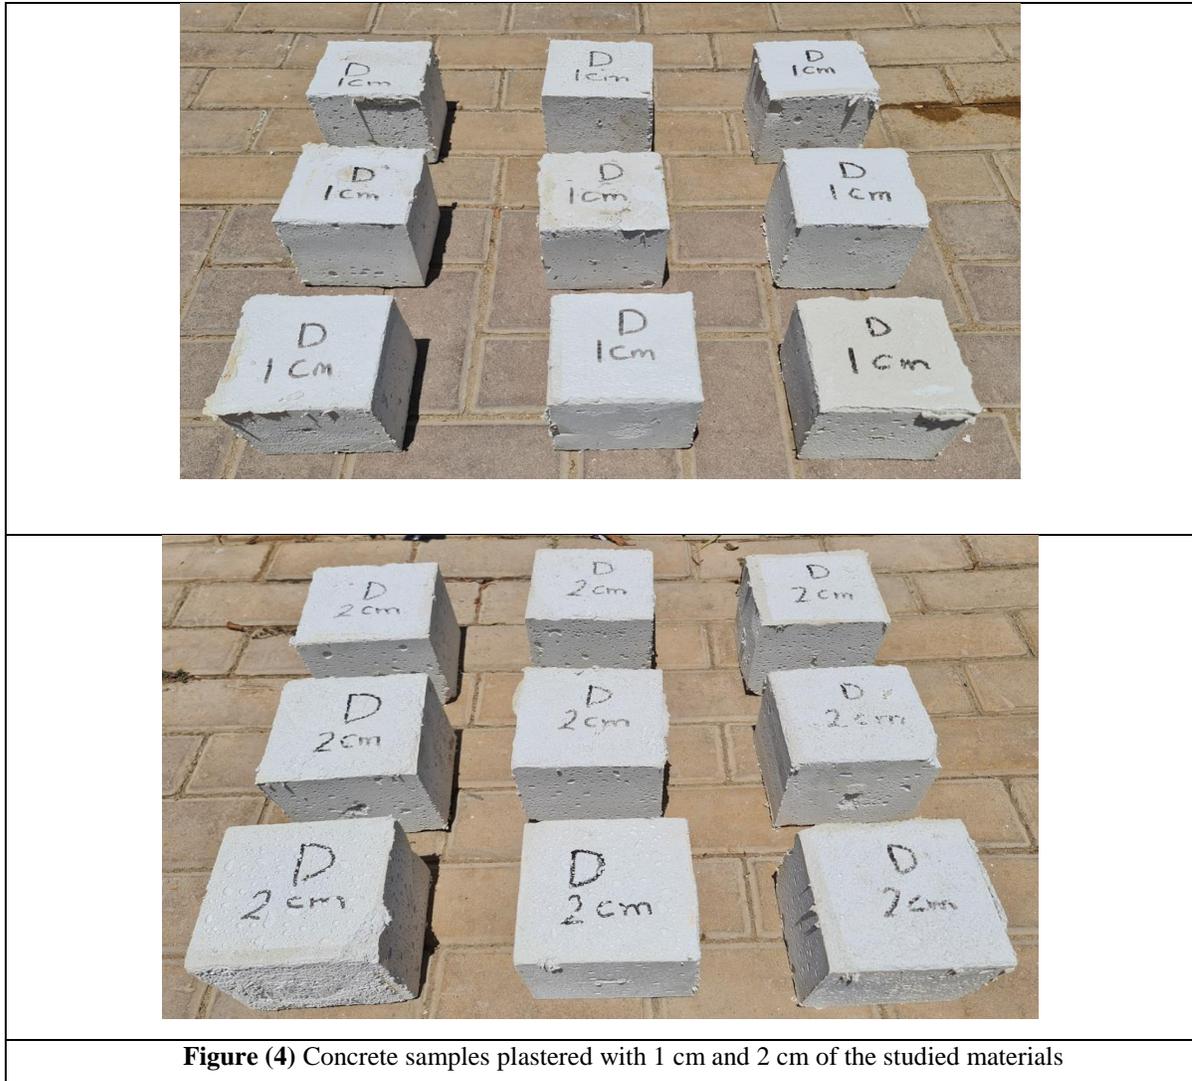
Concrete samples plastered with 1 cm and 2 cm of the studied materials
